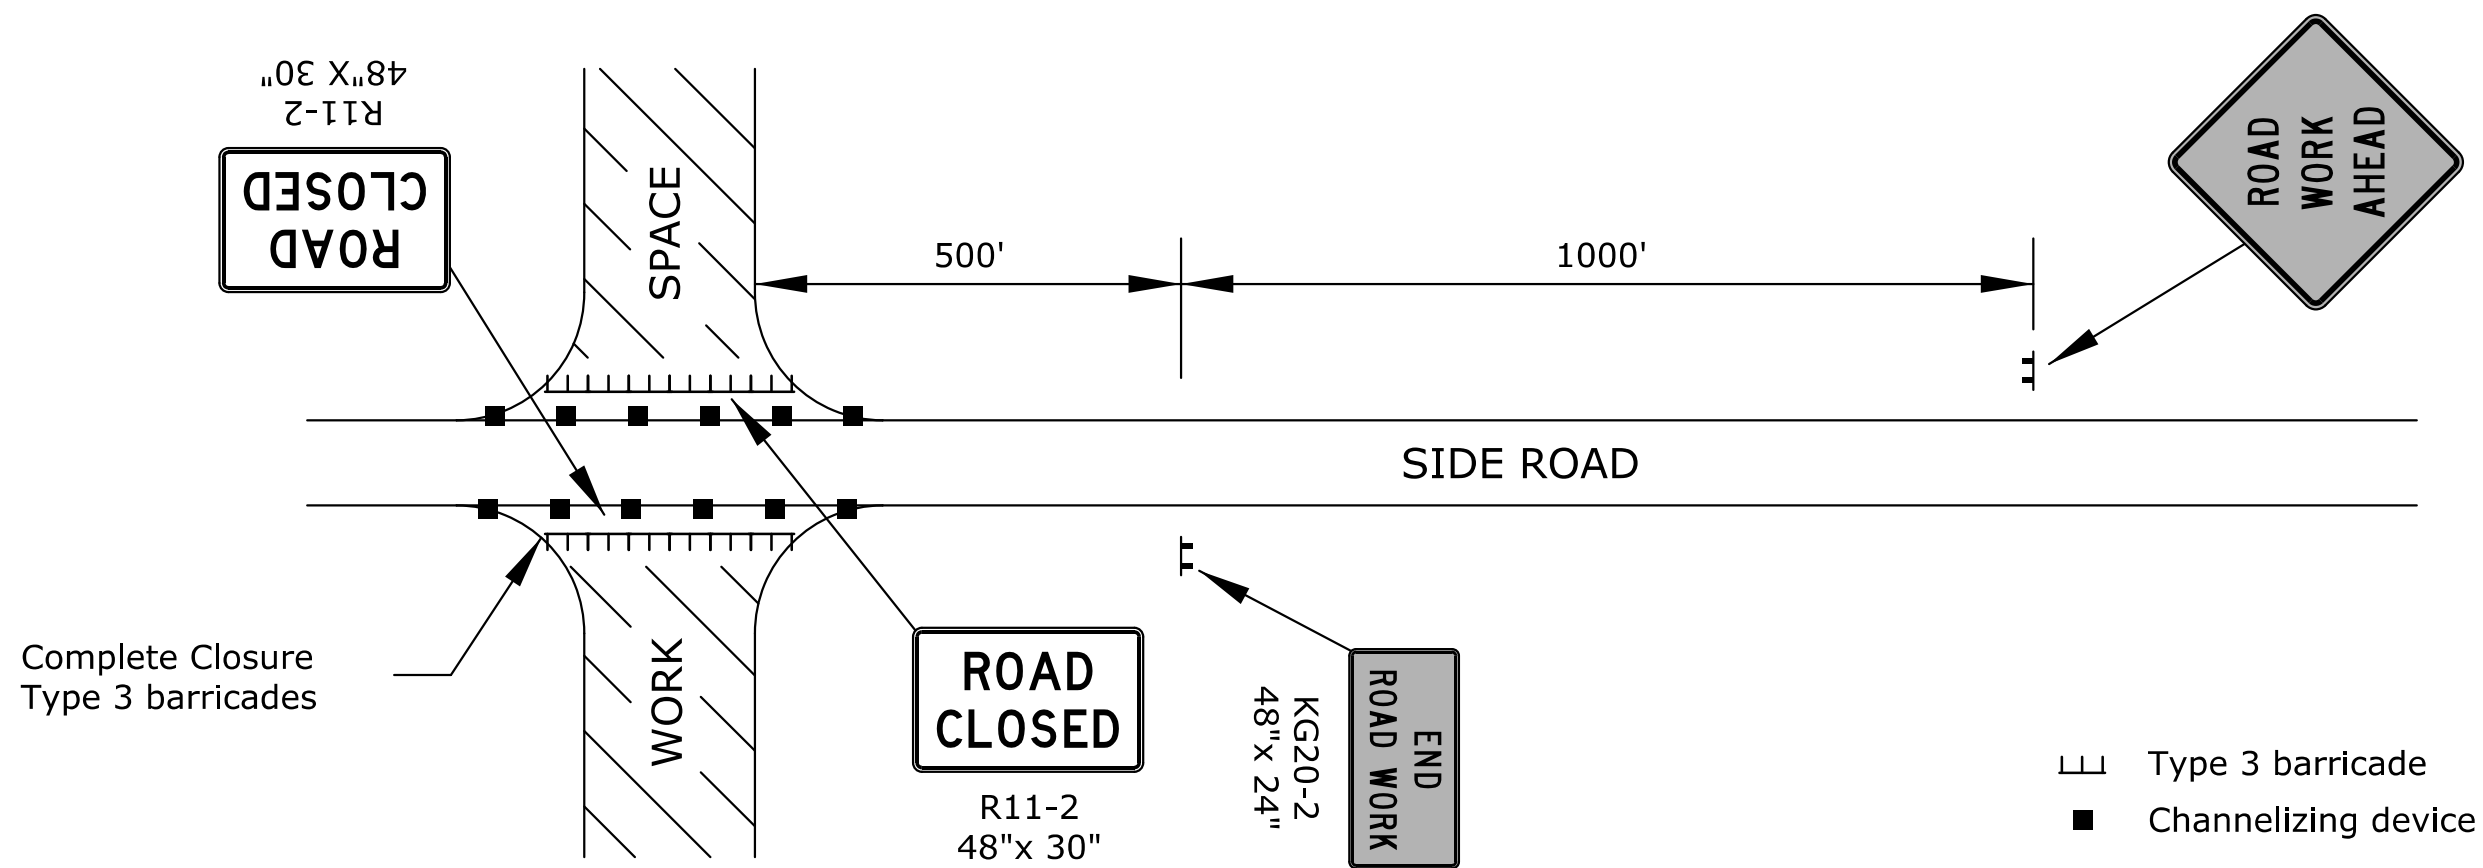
TYPICAL SIGNING FOR SIDE ROAD OPEN
